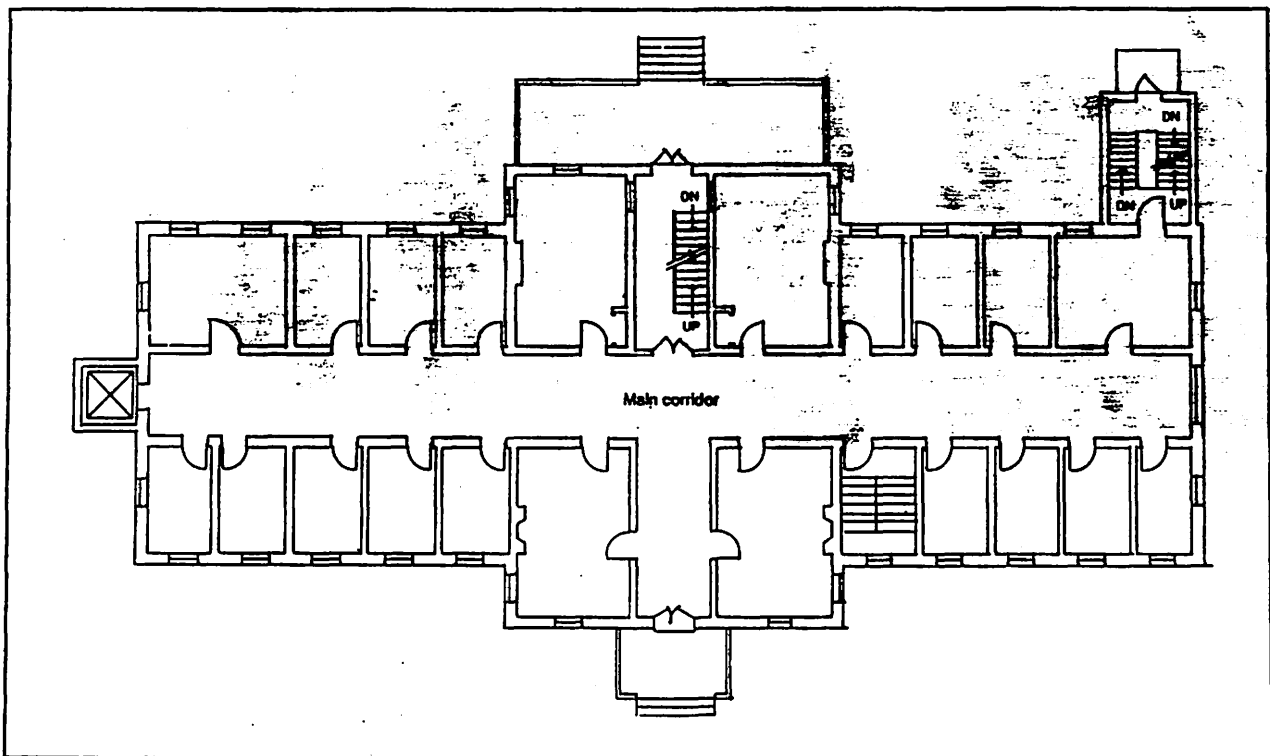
First-floor plan of existing 18th-century Alms House, Bedford, Pennsylvania, to be adapted for reuse. The main corridor was determined to be historically significant.
